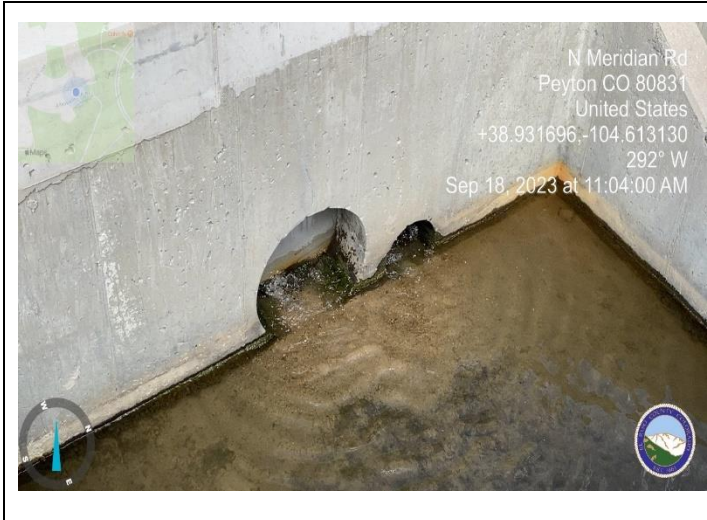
(Pond WU) Gaskets missing from all orifice plates. Install the watertight seal per spec. (GEC page 6.06)
